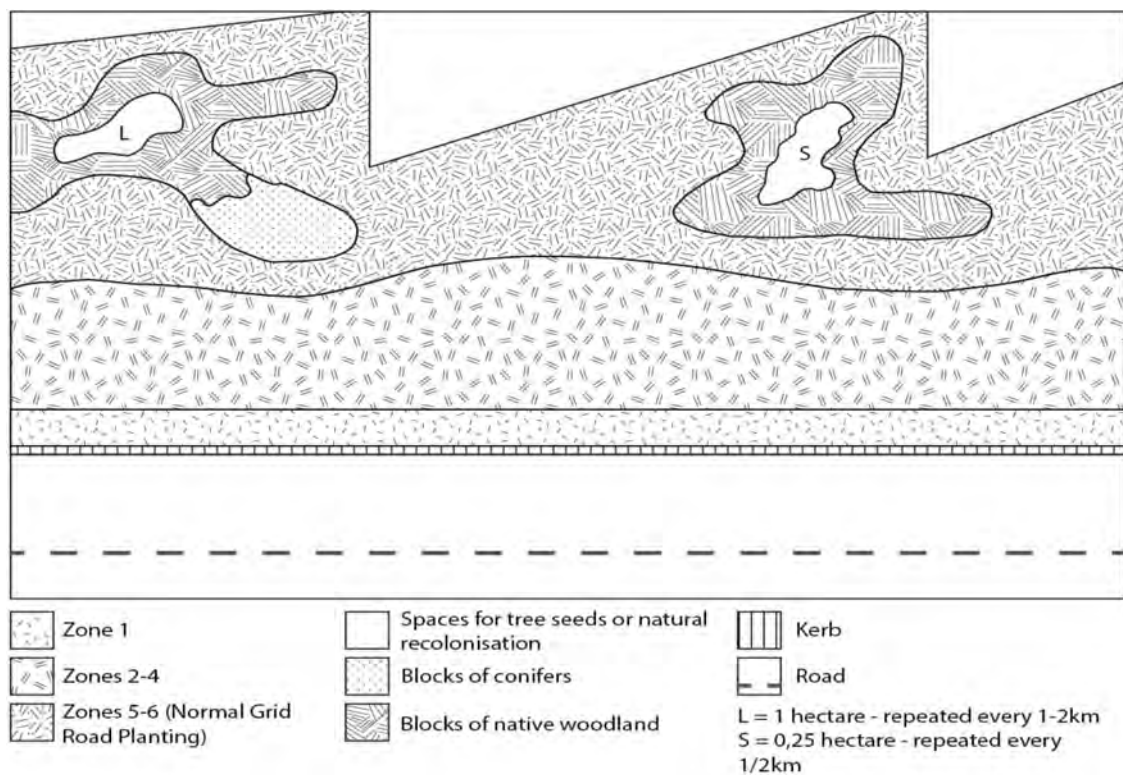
Plan of grid road zonal structure. Source: Kelcey and MKDC, 1974. Redrawn by the author.
